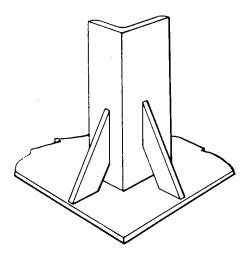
Stiffener plates should be cropped or bar stiffeners should be used.
